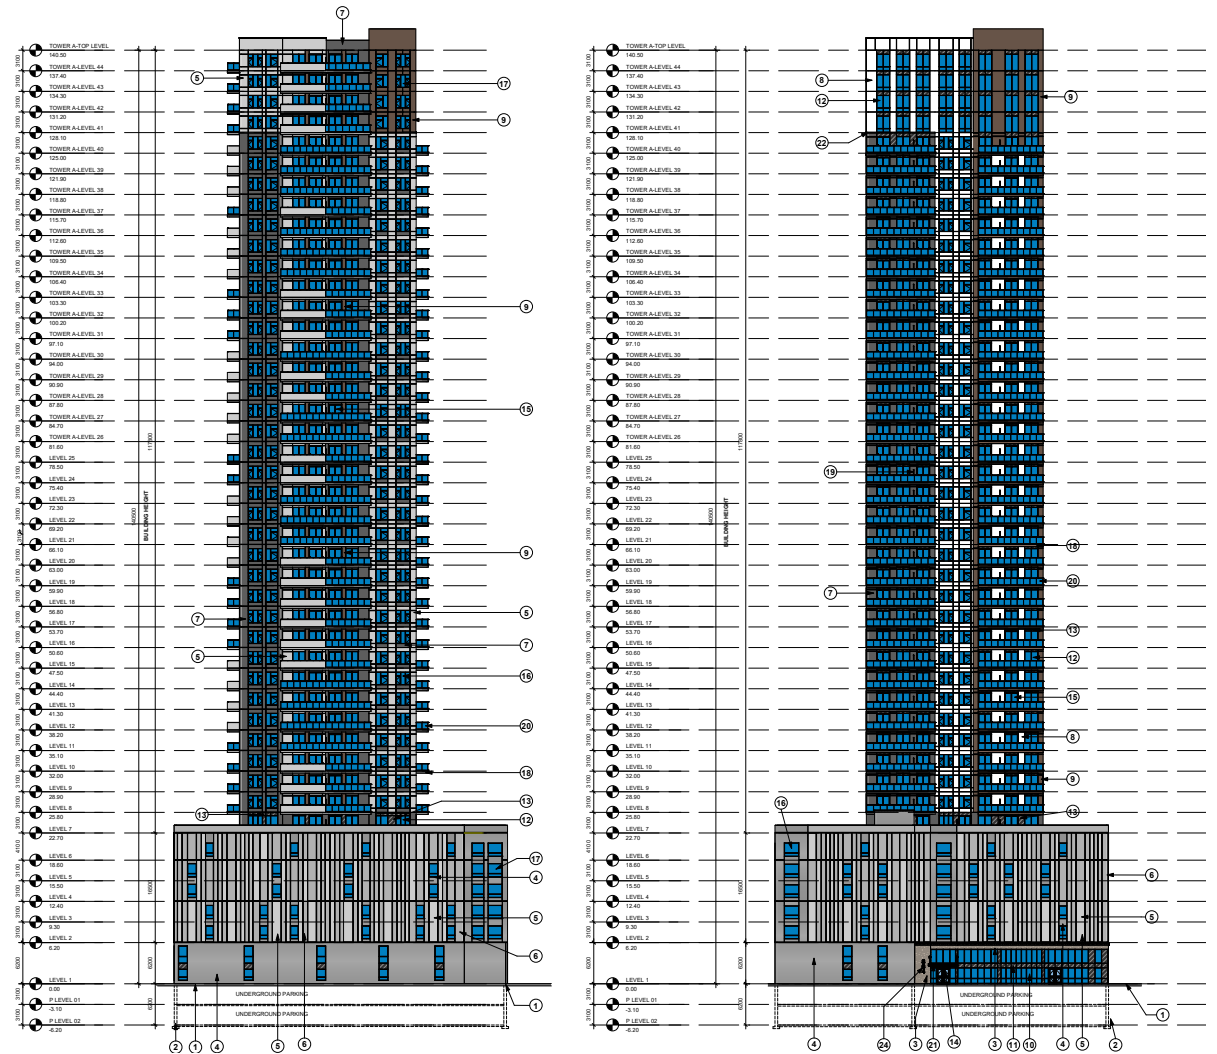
East and West tower elevations showing distinct base, middle, and top portions (Reinders + Law, June 27, 2024)
